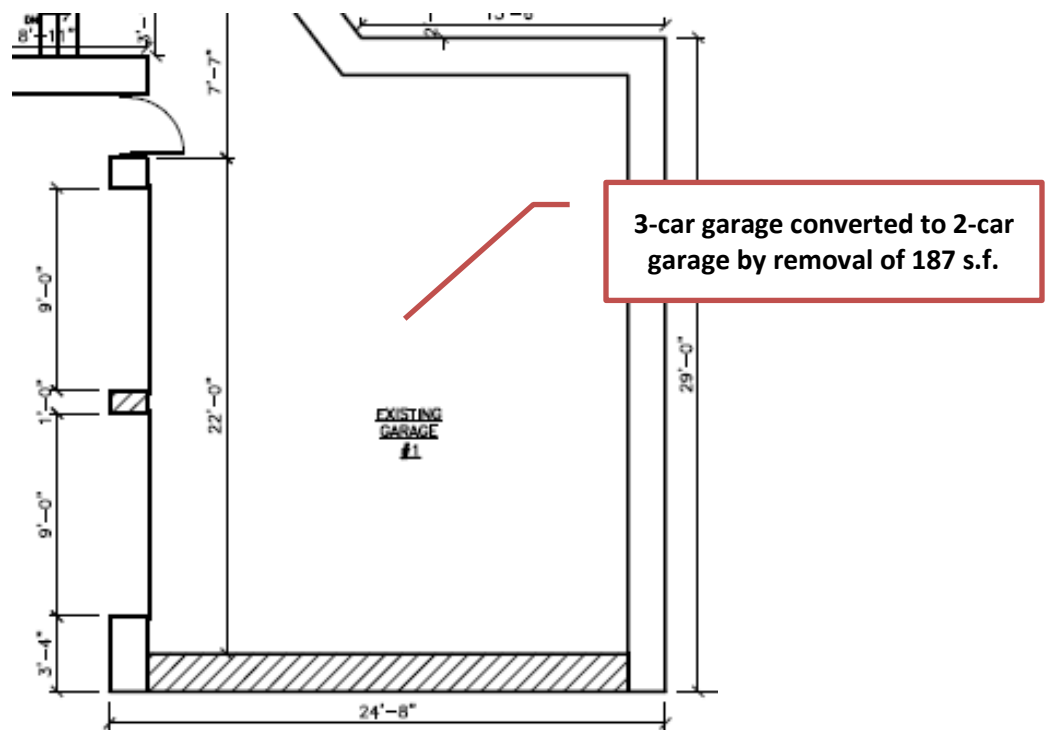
Excerpt of Current Lower Level Plan – Existing Garage
